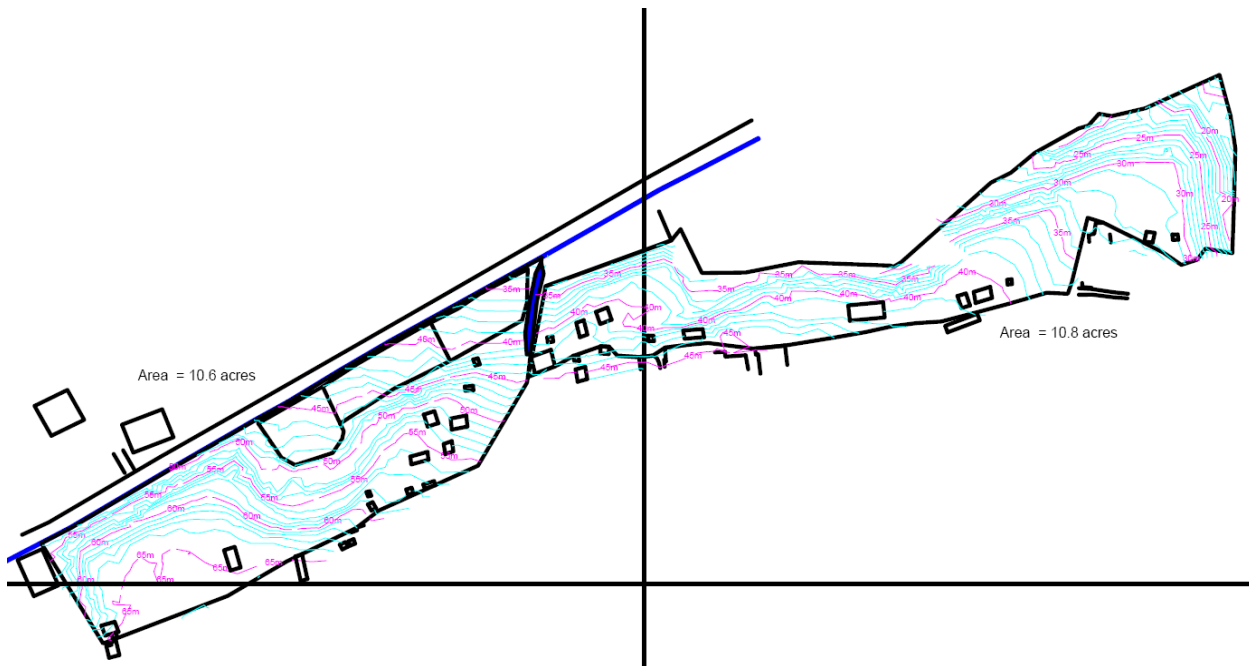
Existing Layout of Mallam No.1 and No.2 Dumpsites
